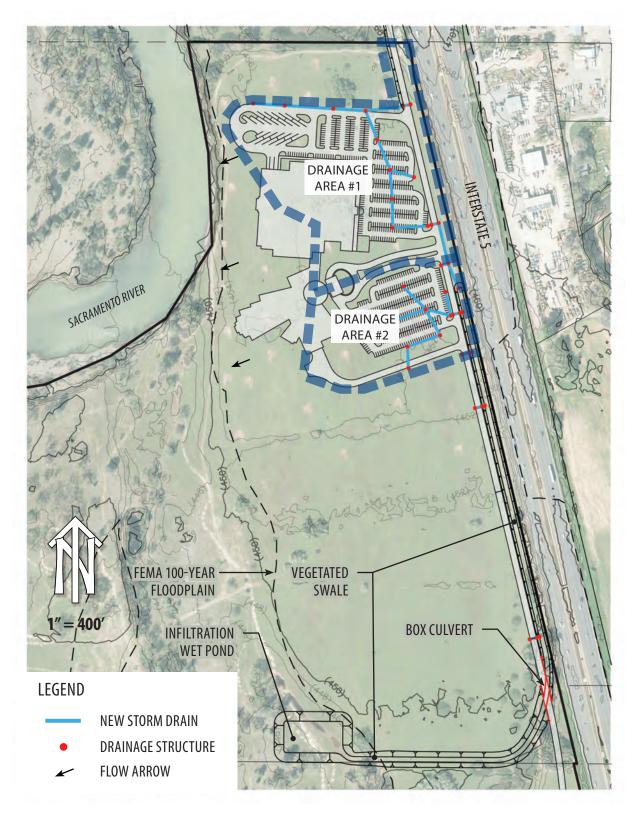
PROPOSED PROJECT - ALT 'D' STORMWATER MANAGEMENT
